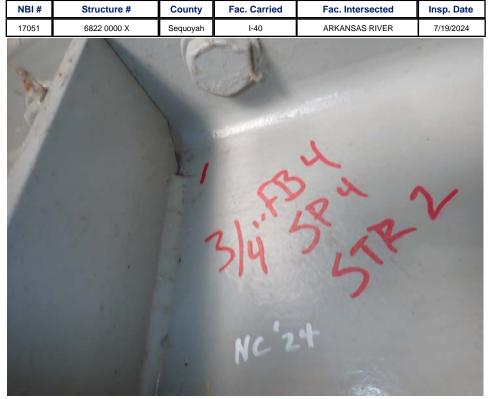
Looking east at span 4, floor beam 4, stringer 1. Note: cracks have now daylighted through to west face of web.
